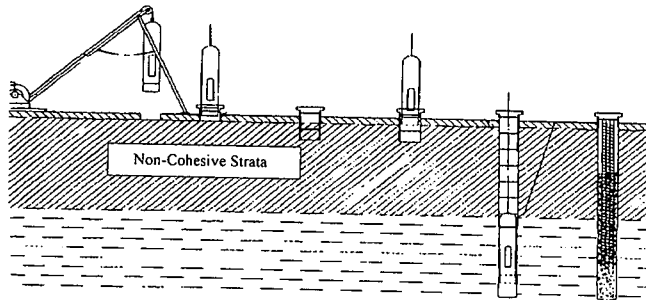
Stages of construction of a percussion bored pile, courtesy of Cementation, Piling and Foundations Ltd.
